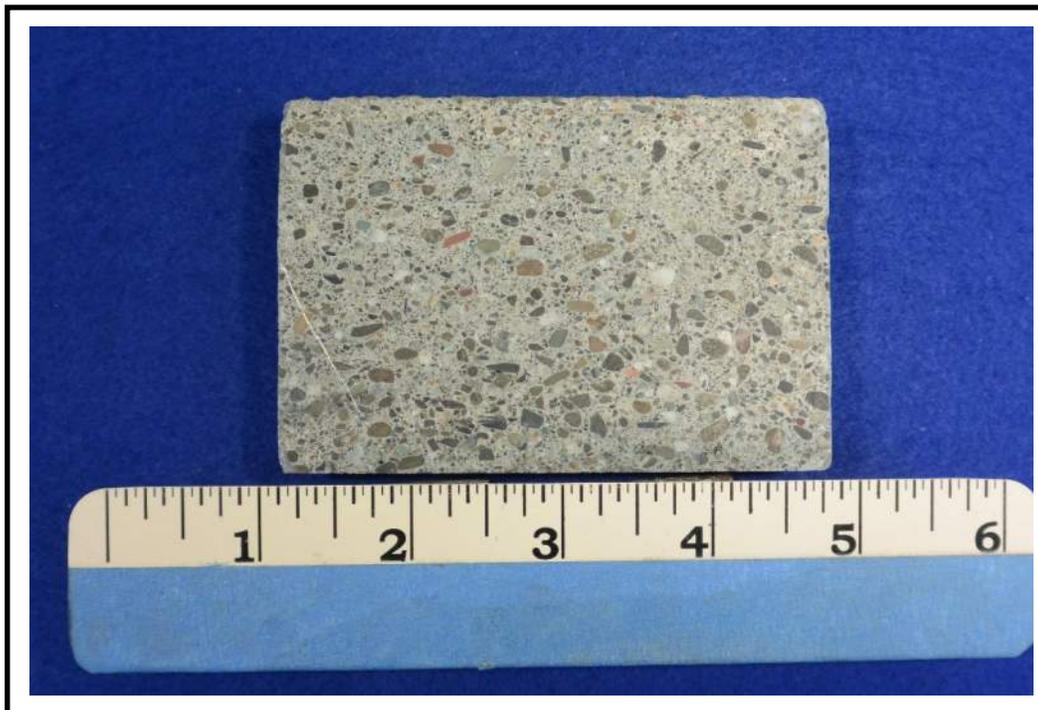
Lapped surface of core No. 6. Exposed surface at top of photo.
